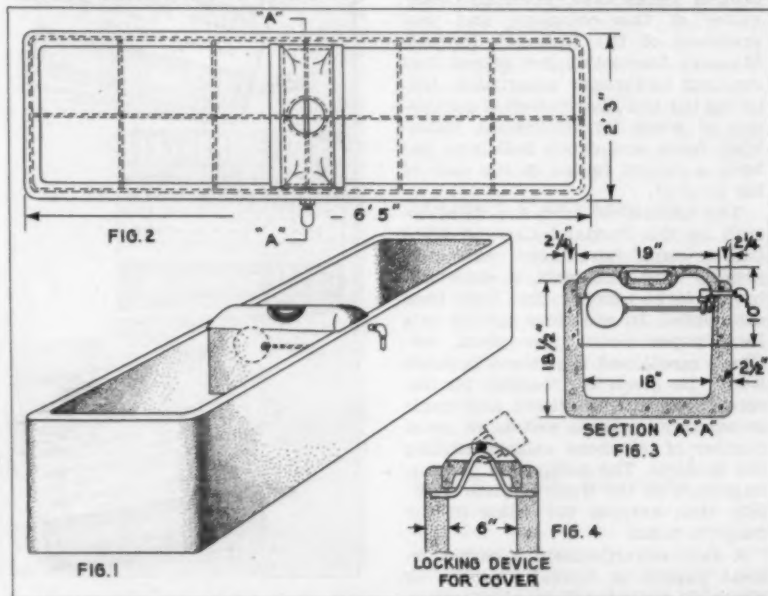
Watering trough of reinforced precast concrete. Fig. 2: Reinforcing details. Fig. 3: Cross-section of ball valve box. Fig. 4: Method of locking valve box
